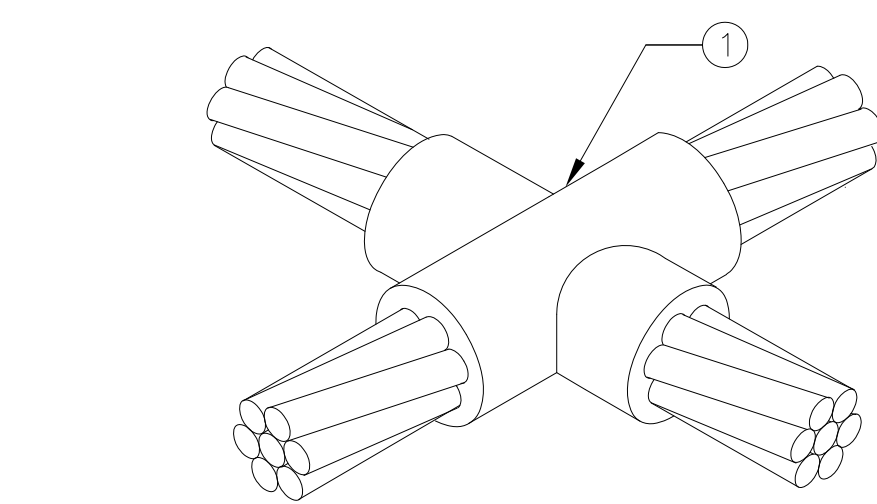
C – HORIZONTAL THROUGH WIRE TO HORIZONTAL REBAR
